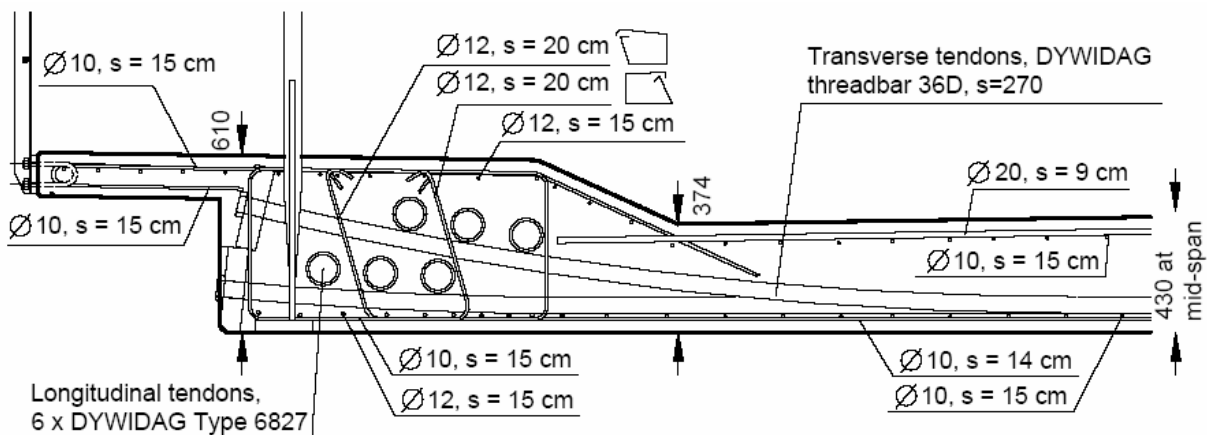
Reinforcement for a tie of a railway bridge designed by Brunn and Schanack, 2003.
